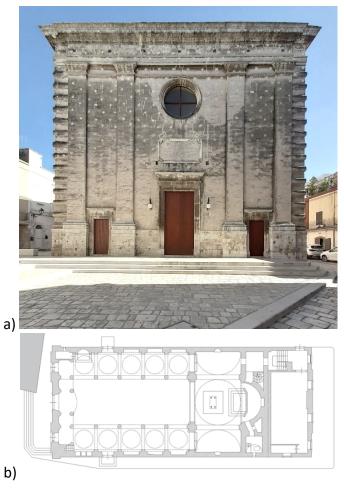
"SS. Salvatore's" church: a) principal façade; b) church's plan
